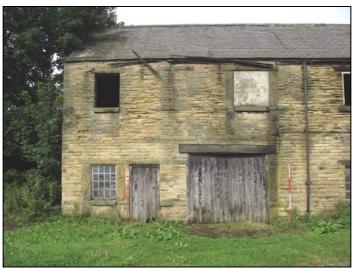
, 83: General view of the Store Building (bays 1&2), Southeast Elevation, from the south
